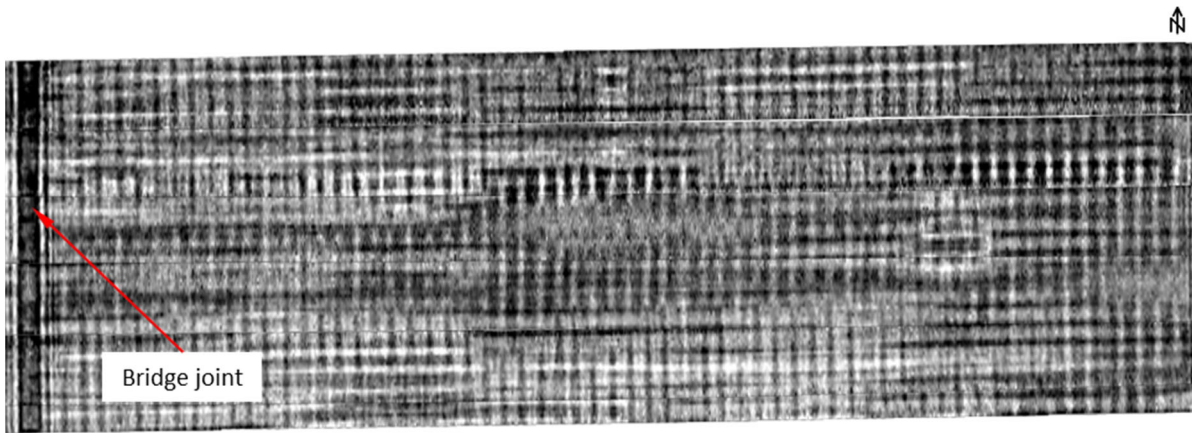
Depth slice at 3.5" showing longitudinal and transverse rebar and bridge joint – segment of a stitched area covering the westbound lane.
